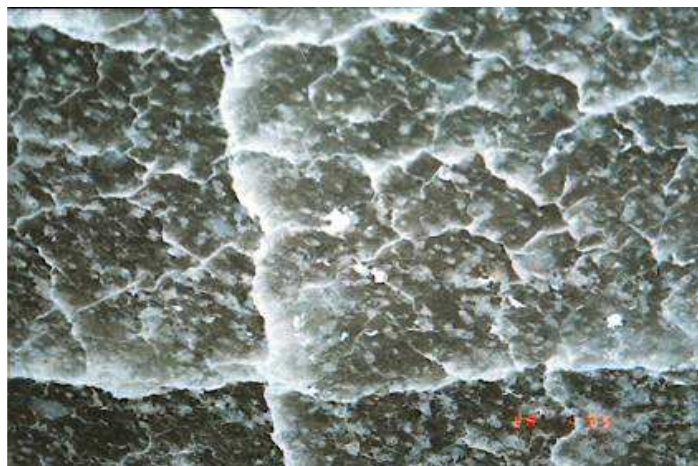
Strongly cracked concrete in ceiling slabs over the centre of fire
